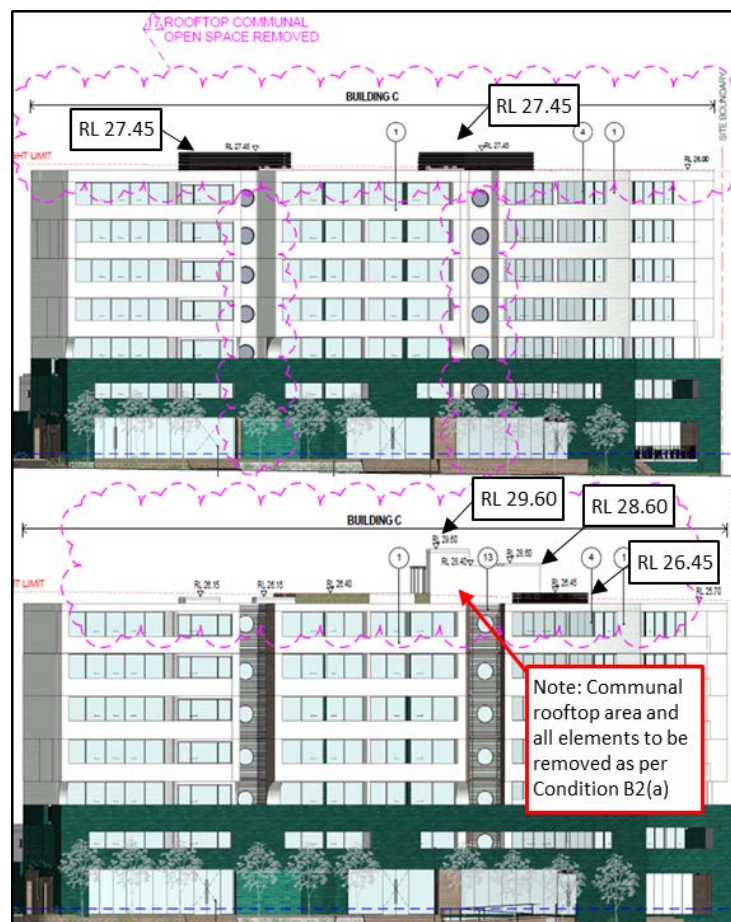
| Proposed (top) and approved (bottom) Building C elevations (Source: SSD 8019 Approved Plans and SSD 8019 MOD 1 Plans)
